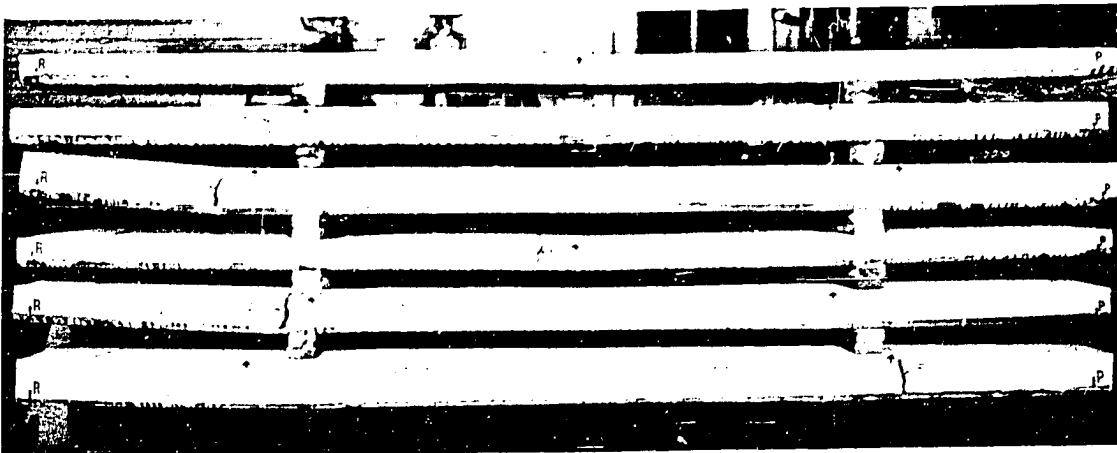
Typical shear-bond failures of beams constructed with deck G-20 and 24 gage. Each beam was approximately 28 inches wide and 12 feet in length with variable depths
